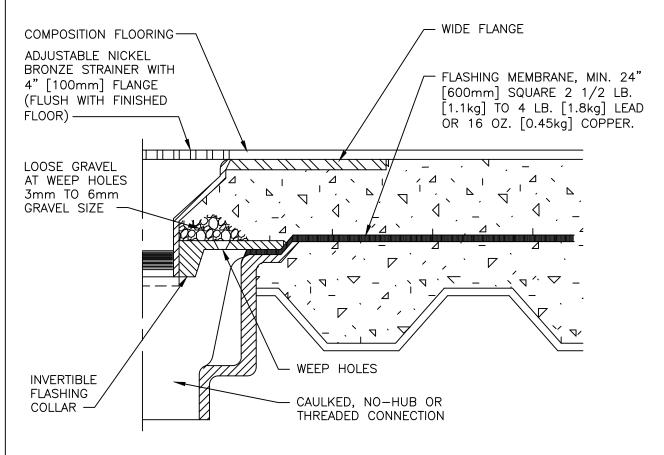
DETAIL TITLE / TYPE "C" FLOOR DRAIN DETAIL
